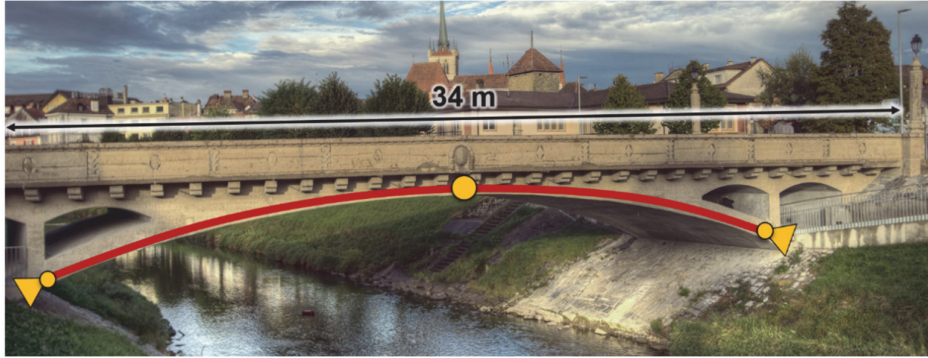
\_ The Guillermaux Bridge, its arc and hinges before intervention
